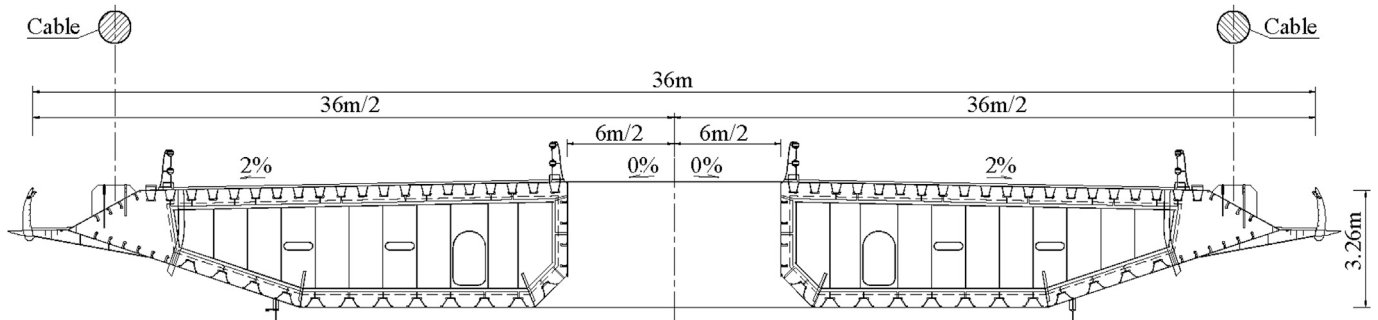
Central-slotted box girder of Xihoumen Bridge.
